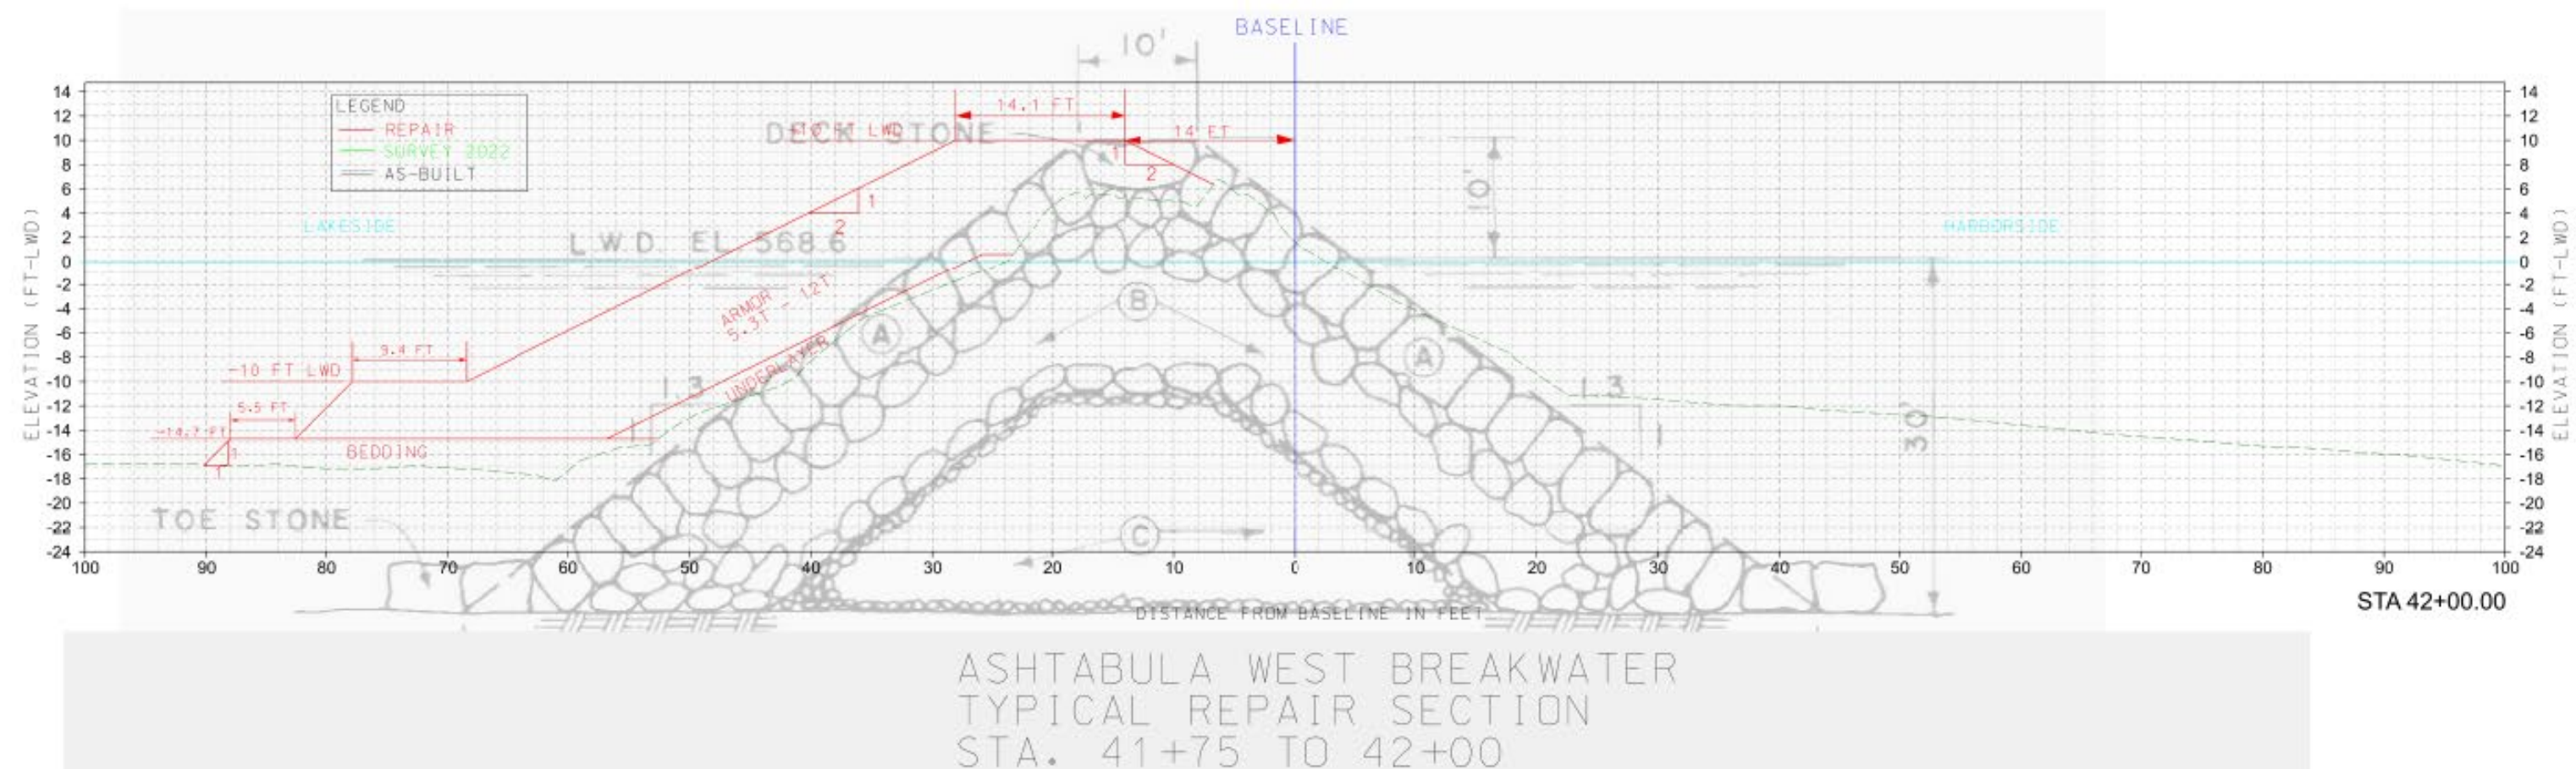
Typical Repair Cross Section, Zone 2 Stations 41+75 to 42+00
